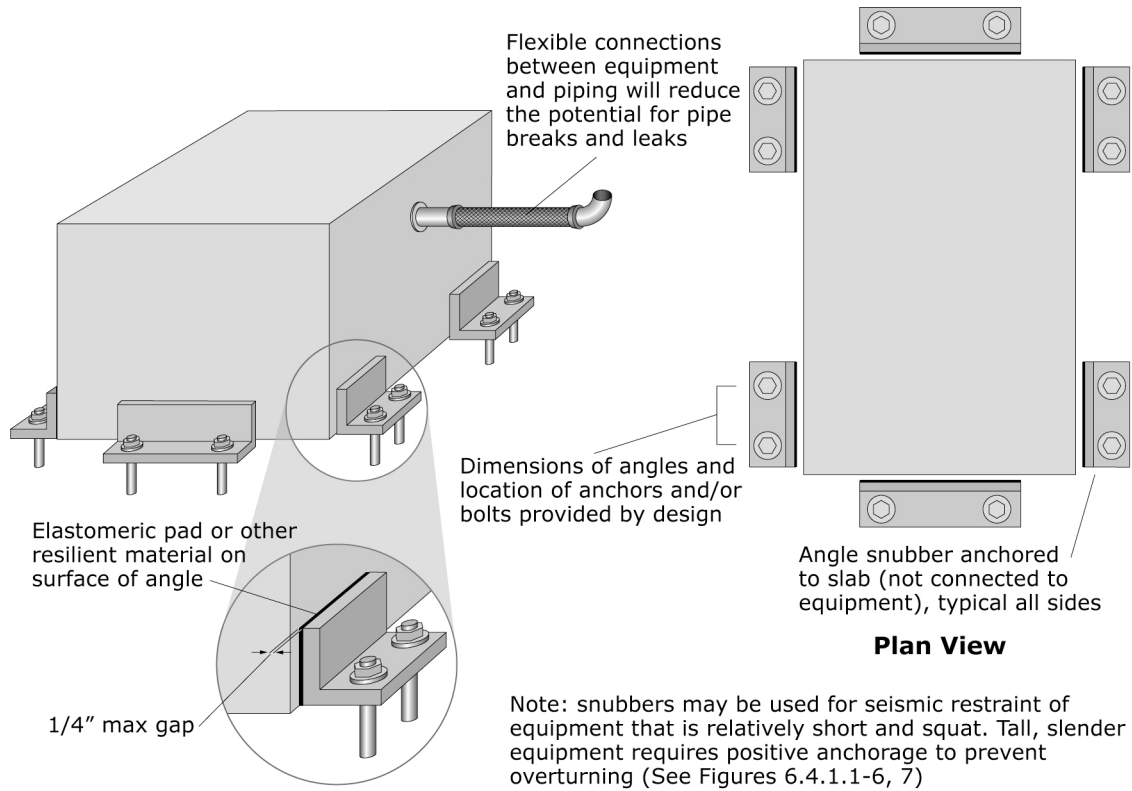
Floor-mounted equipment – restrained with snubbers.
